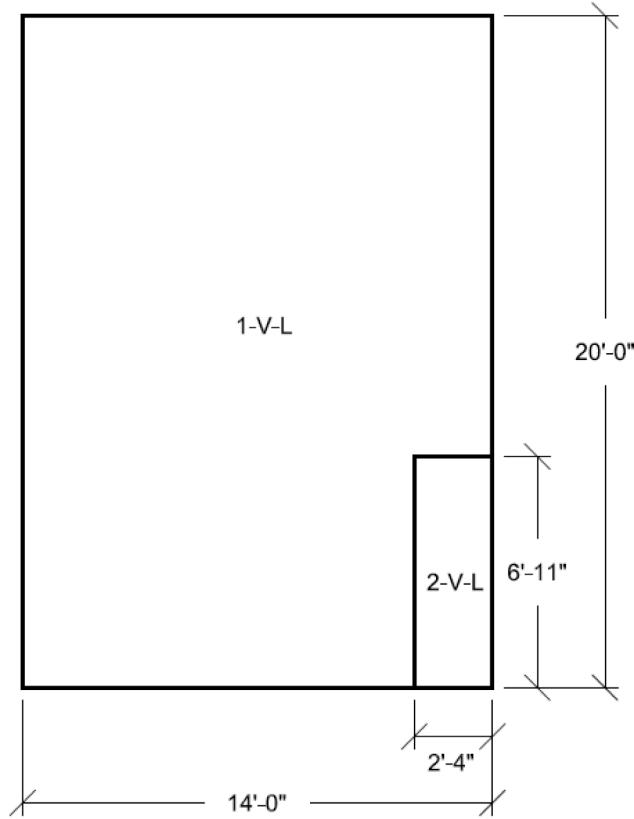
H.6-180A DGFOSV Wall 10 Looking From Outside Vertical Reinforcement Zones Far Side Face
